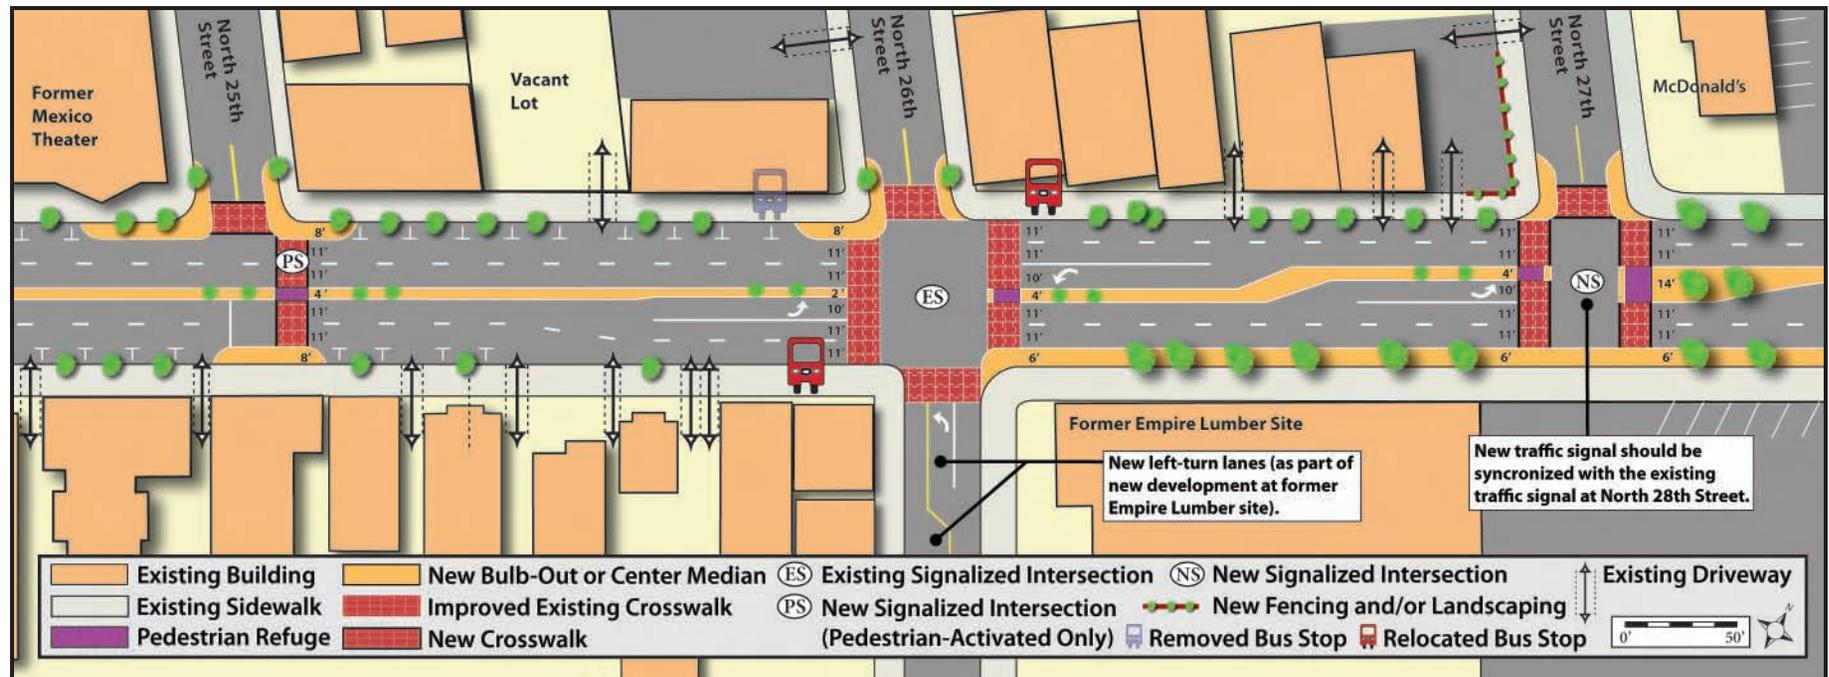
East Santa Clara Street/Alum Rock Avenue - Segment #4.
